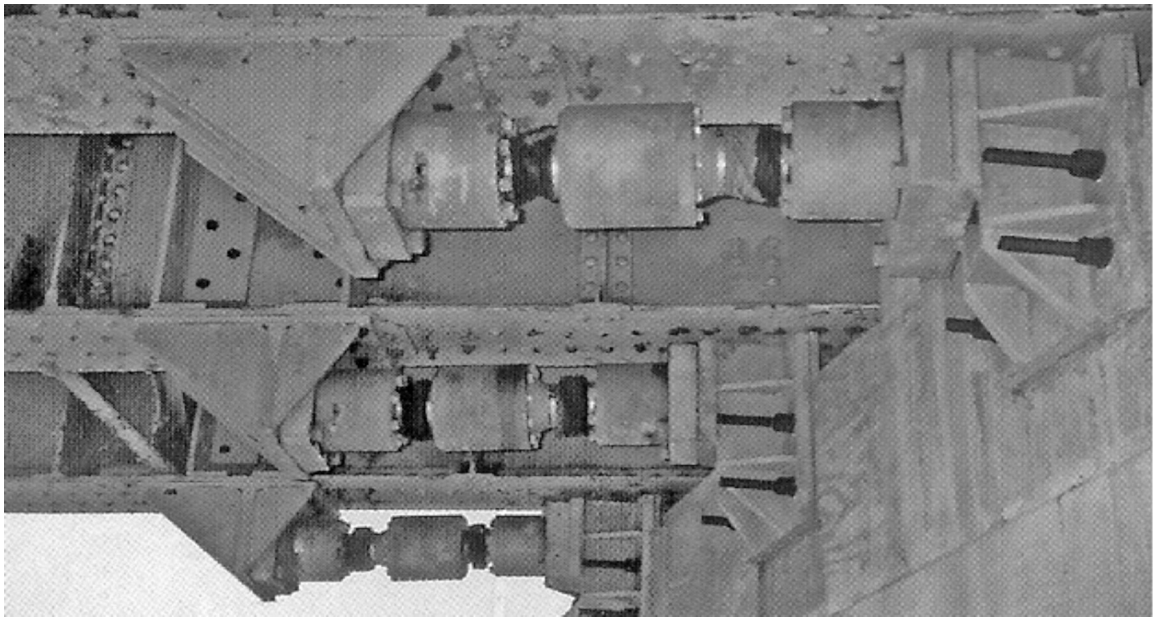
Four STUs of 1000 kN capacity installed at the abutment of Neath Railway Bridge
